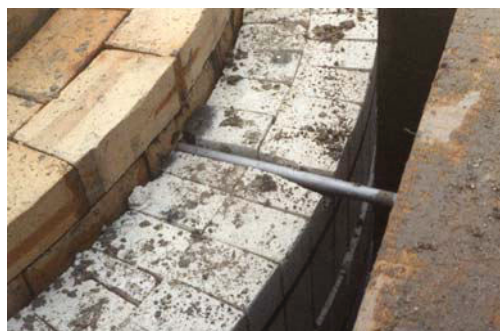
Detail of one of 12 stainless steel conduits for thermocouple placement driven through outer concrete skin, insulating blocks and brick kiln lining, prior to pouring of insulating concrete.
